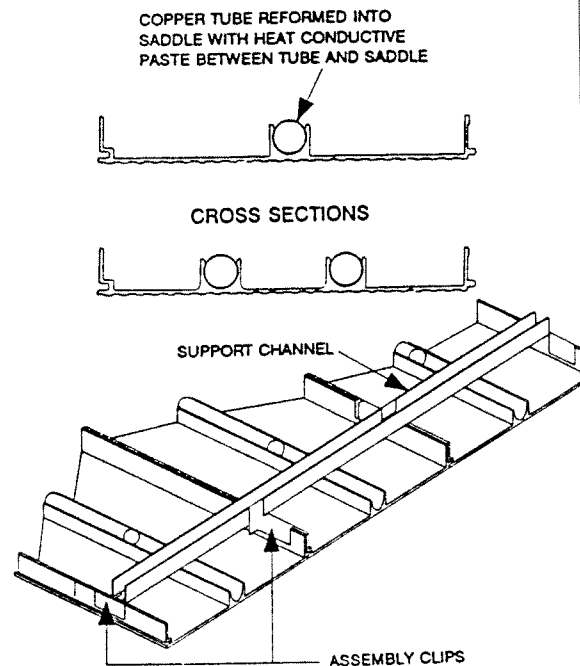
Extruded Aluminum Panels with Integral Copper Tube
